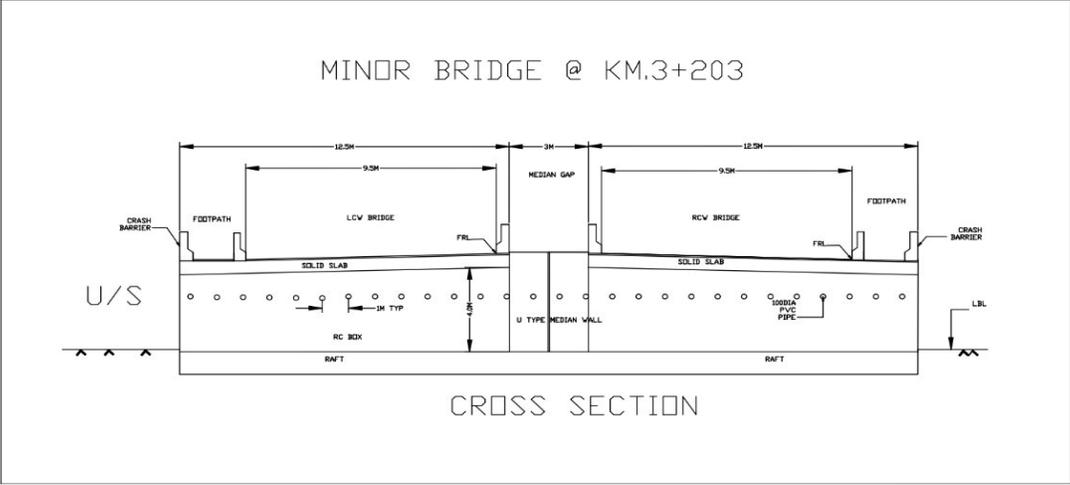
Cross Section of MINOR BRIDGE @ Km.3+203
